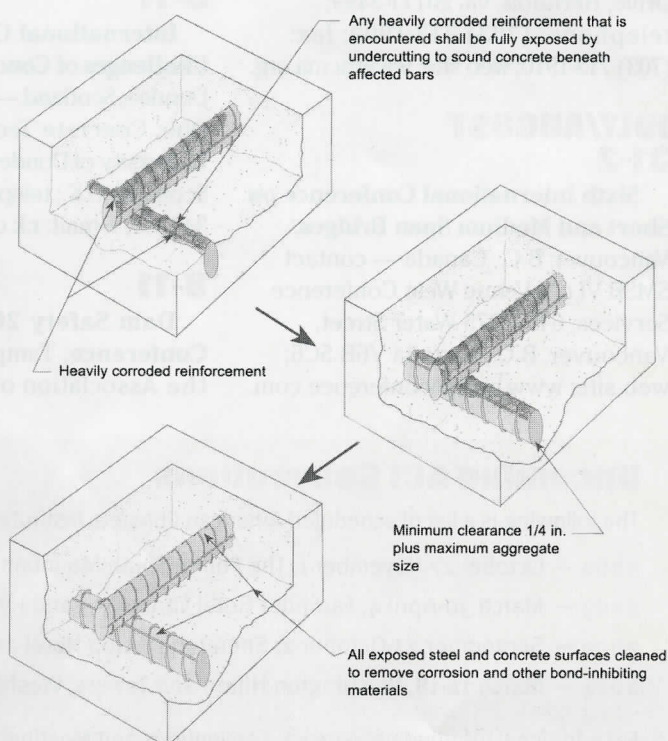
Removal of concrete from around reinforcing bar (adapted from ICRI 03730)
